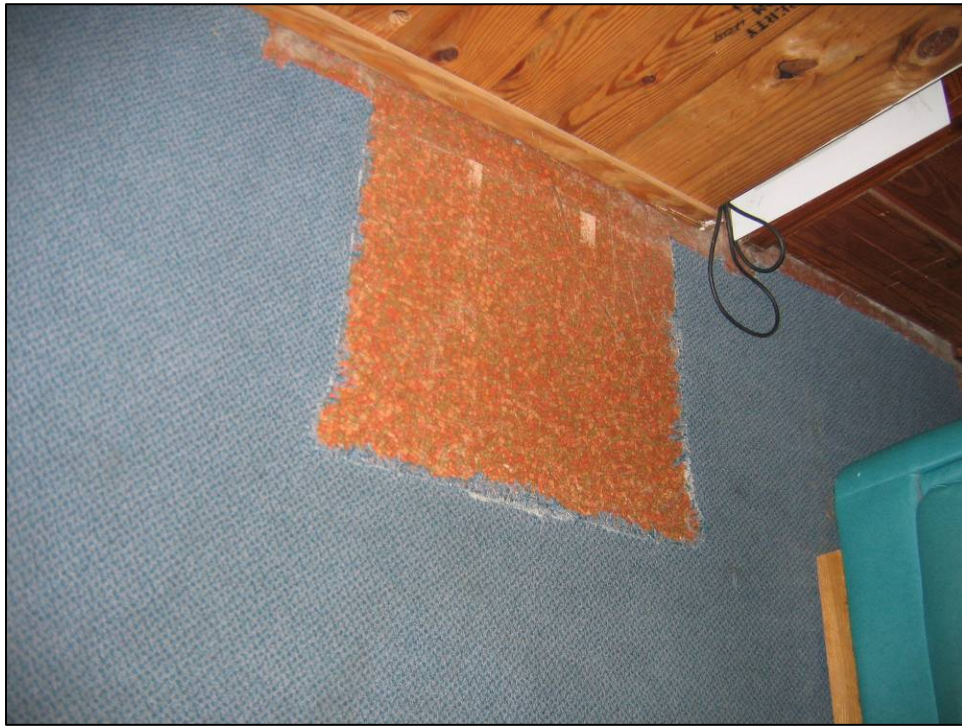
Room 112 (part of former boat room), floor at northwest corner.
